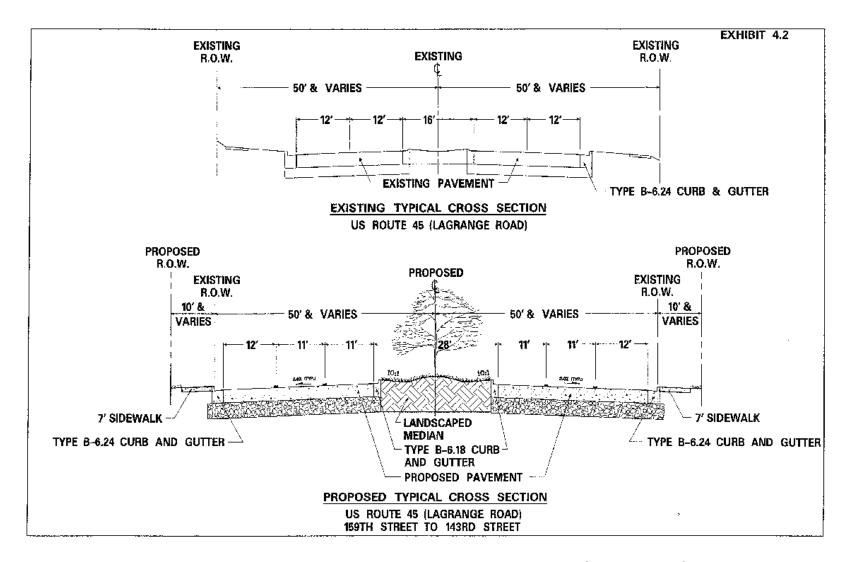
Existing and IDOT Proposed Typical Cross Section, 143<sup>rd</sup> Street to 159<sup>th</sup> Street
